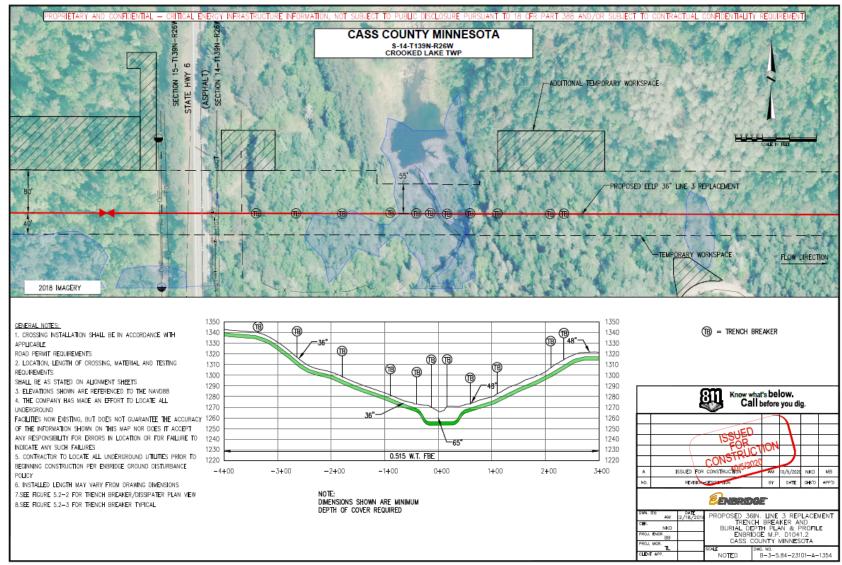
Trench Breaker Burial Depth Plan and Profile
